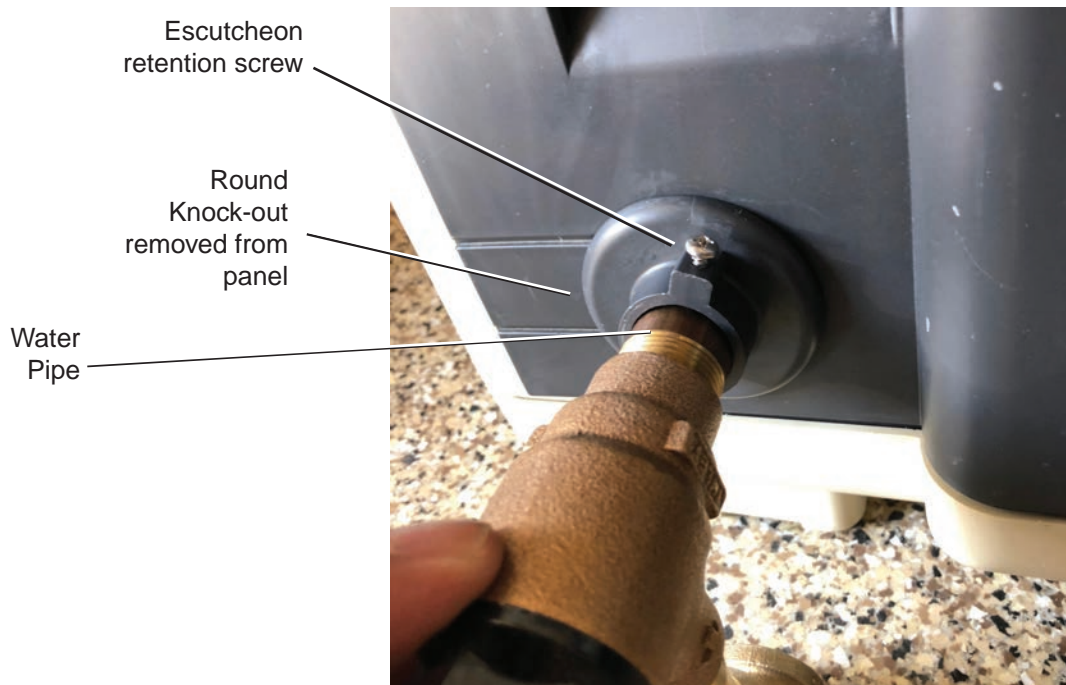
Escutcheon installed on Pressure Relief Valve water pipe. Be sure the escutcheon covers the circular opening in heater panel.
